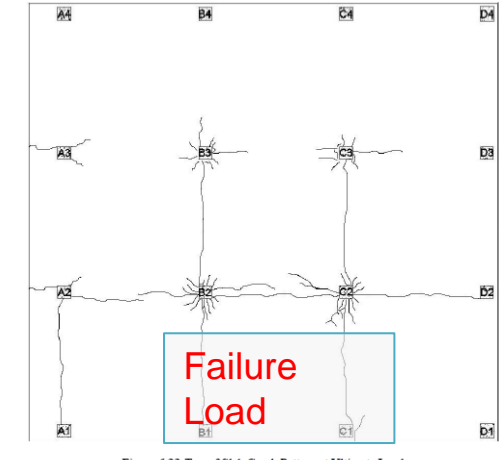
Top of Slab Crack Pattern at Ultimate Load
